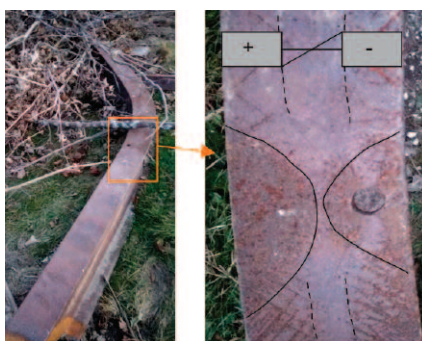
The range of plastic zones at the openings going from cross-section B (span) to cross-section E (at the support)
